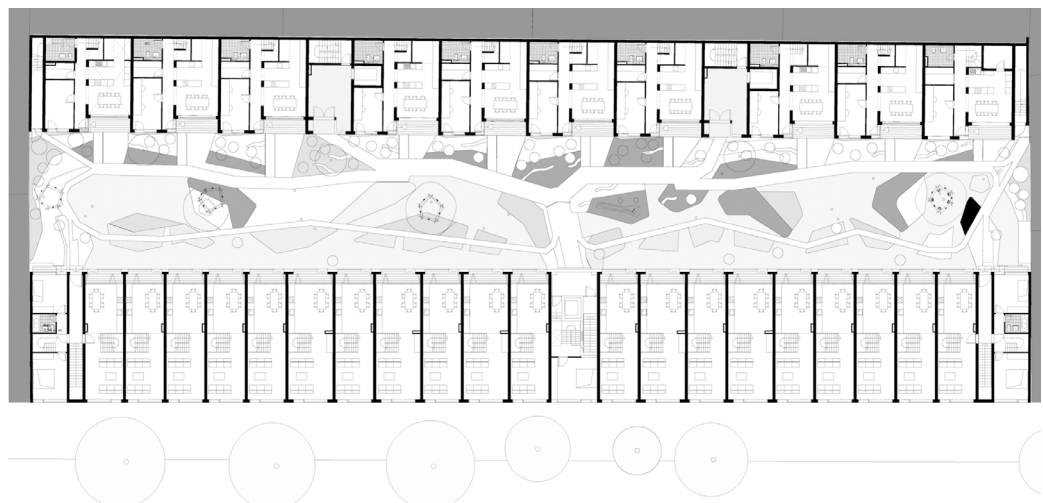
Zelterstr. Housing Berlin. The back-to-back typology is used against the party wall. Towards the street has four-story townhouses with a roof terrace (© zanderroth architekten).
